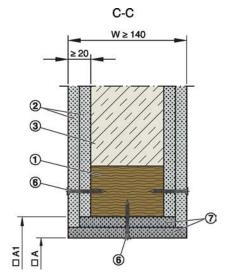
Lightweight partition wall, half-timbered construction with cladding on both sides
